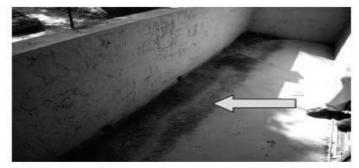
Unit 326: Balcony area, notice evidence of ponding water. Typical of the 2 bedroom / 2 bathroom units.
